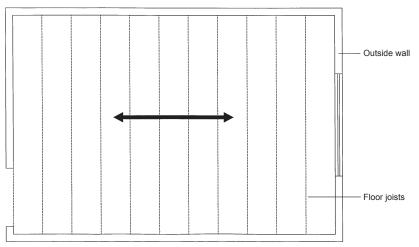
For tile, parquet and linoleum finished floors, install Quik Trak panels perpendicular to the floor joists. This will add strength to the floor and help prevent deflection of the floor.
